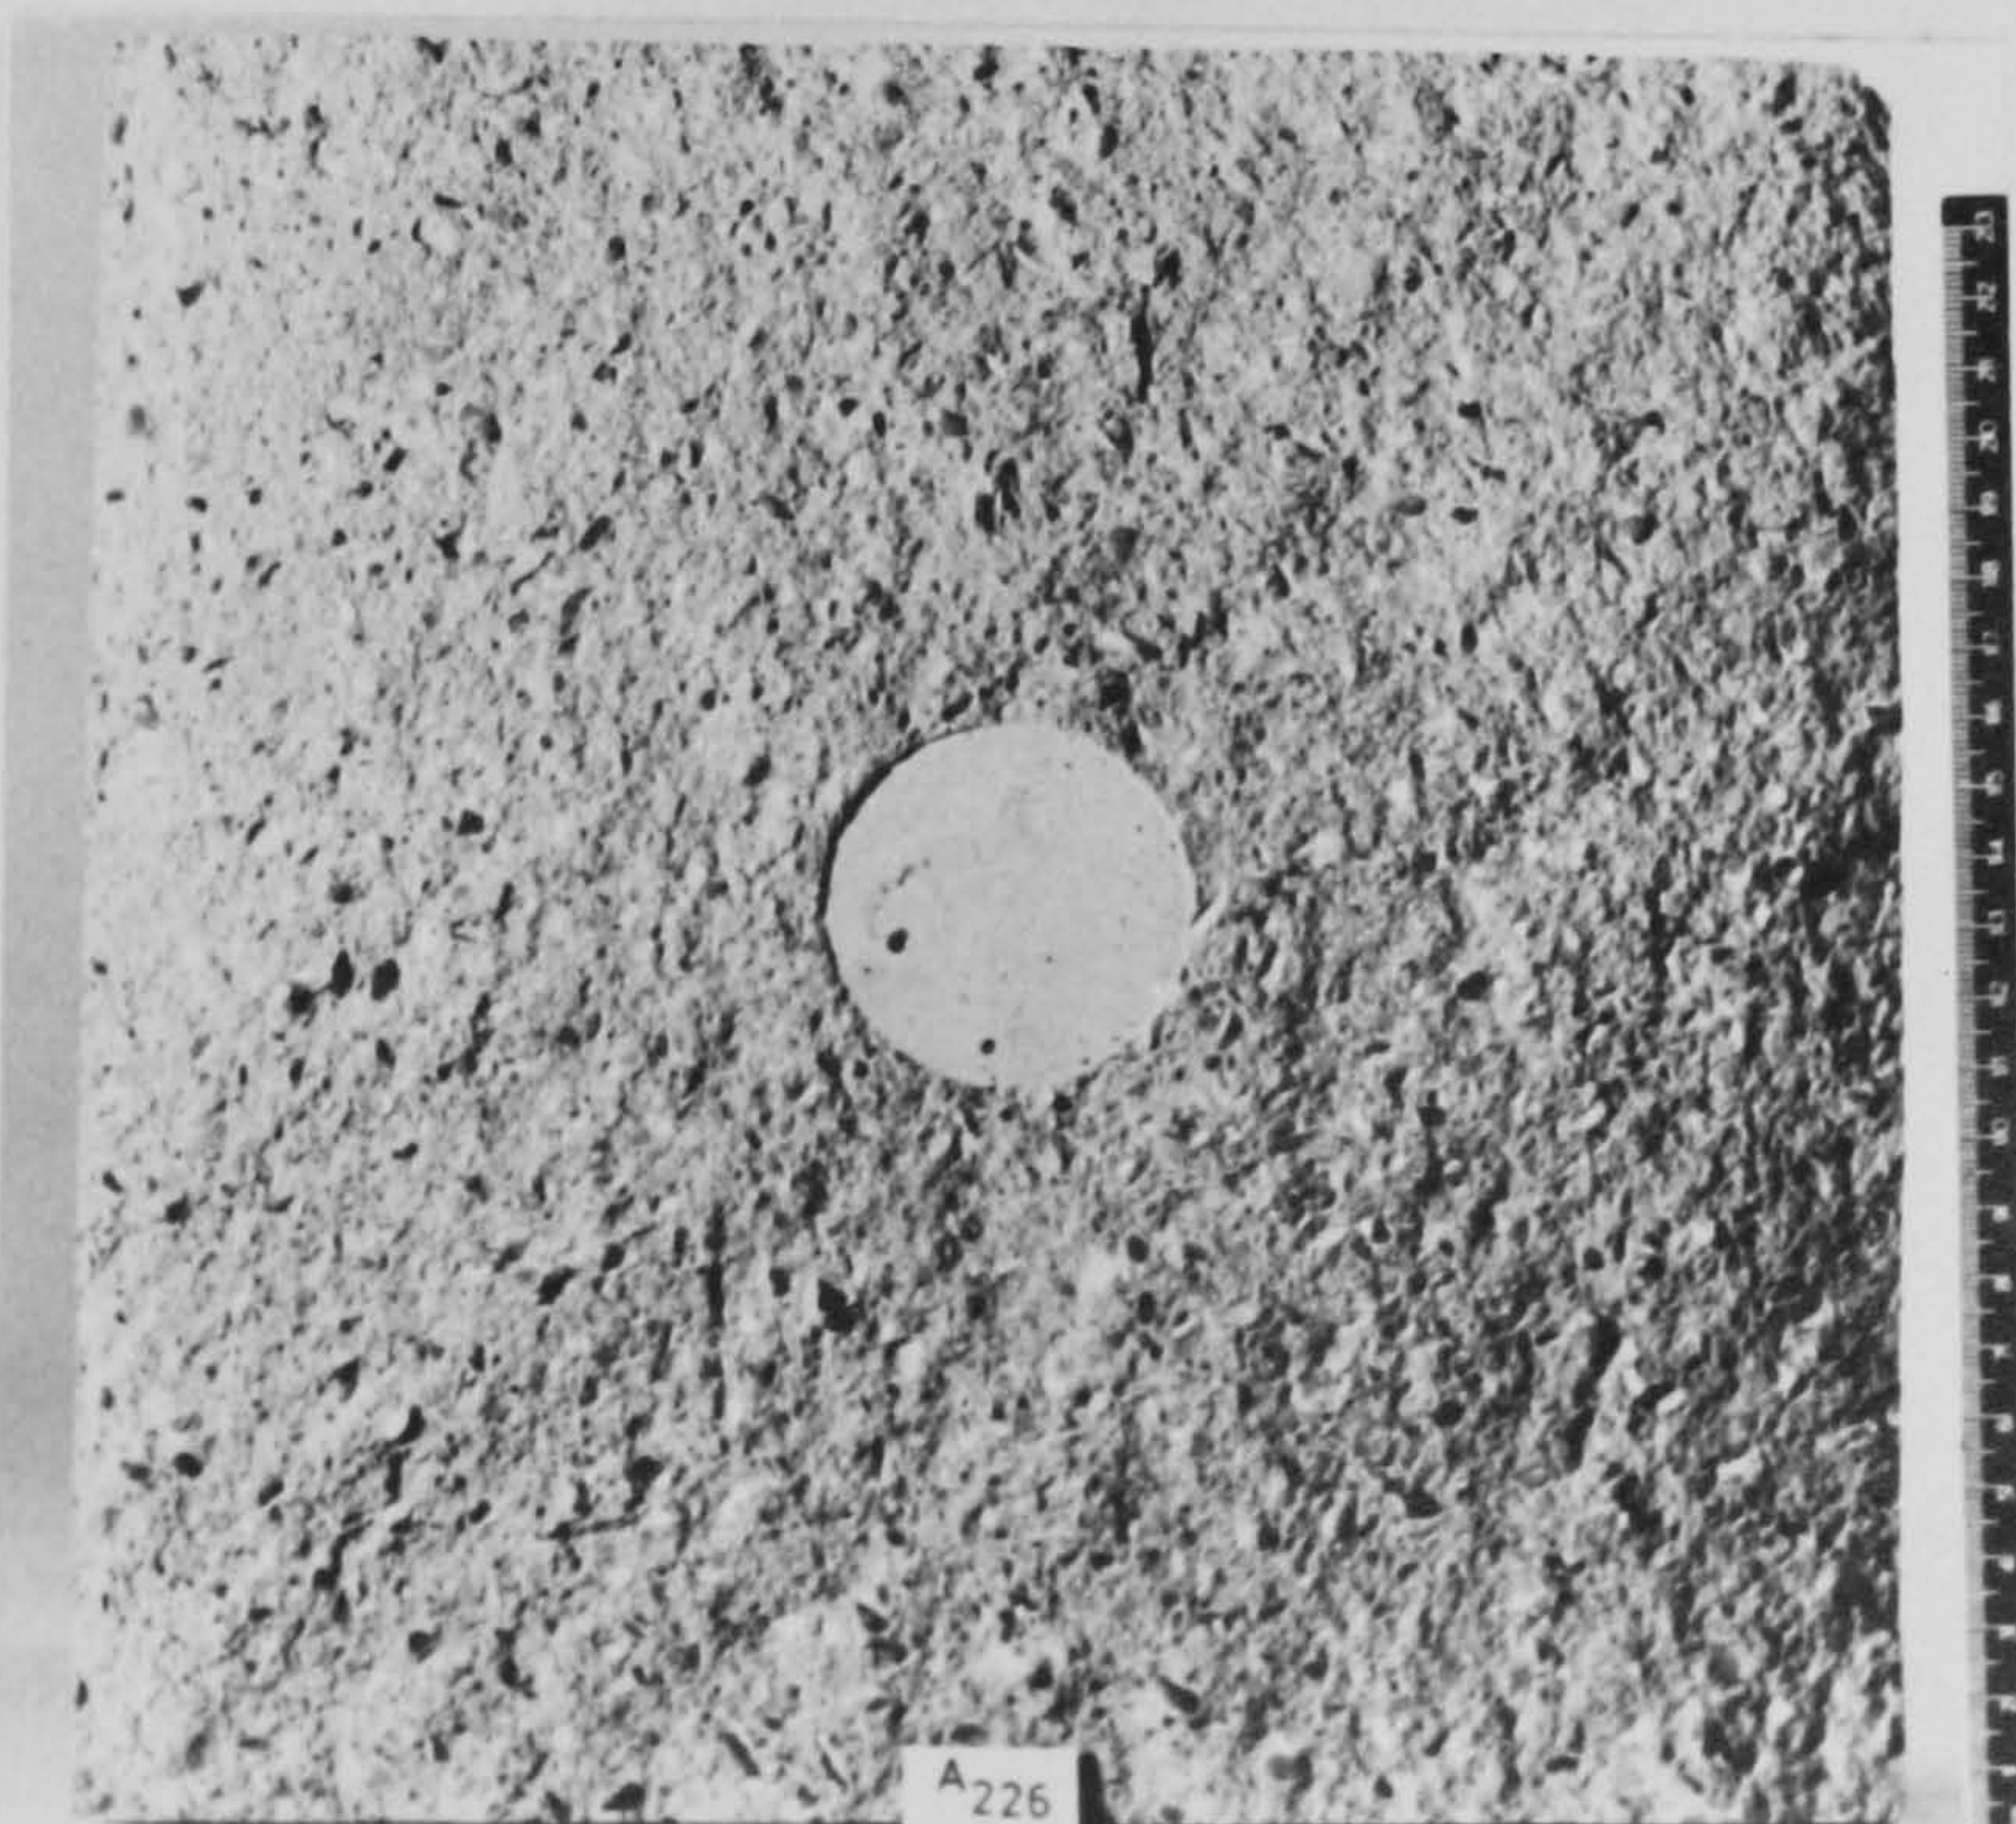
SPALLED PIECE FROM SPECIMEN
